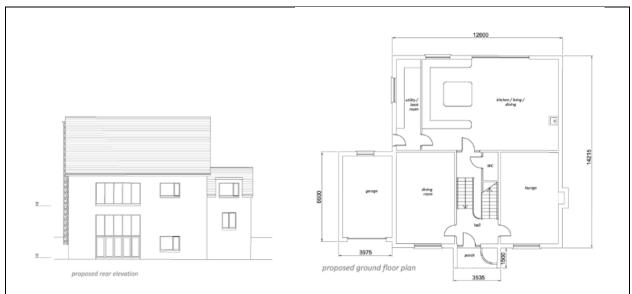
House Type J at Site 26 with 1st floor living accommodation
